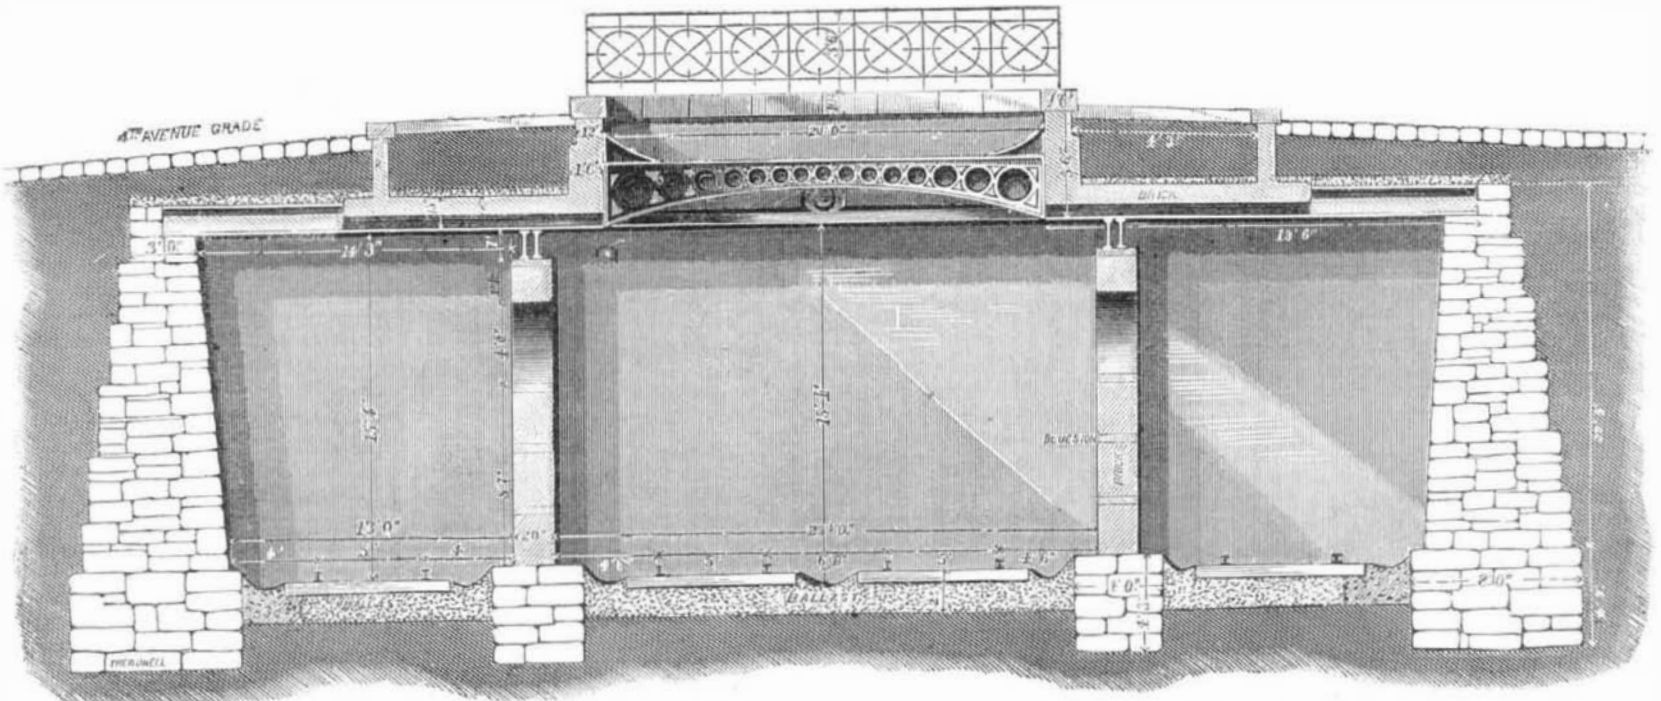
THE UNDERGROUND RAILWAY IN NEW YORK CITY.—CROSS SECTIONAL ELEVATION OF THE BEAM TUNNELS AND VENTILATORS 59th TO 76th STREETS
